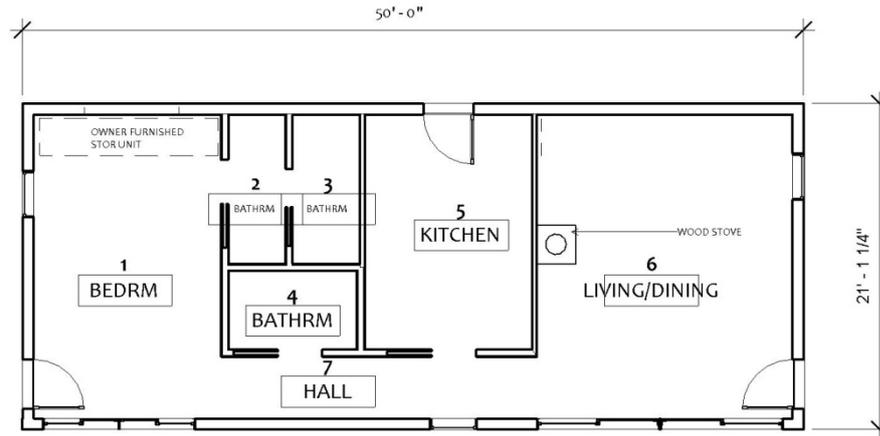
Revit floor plan of baseline model.
